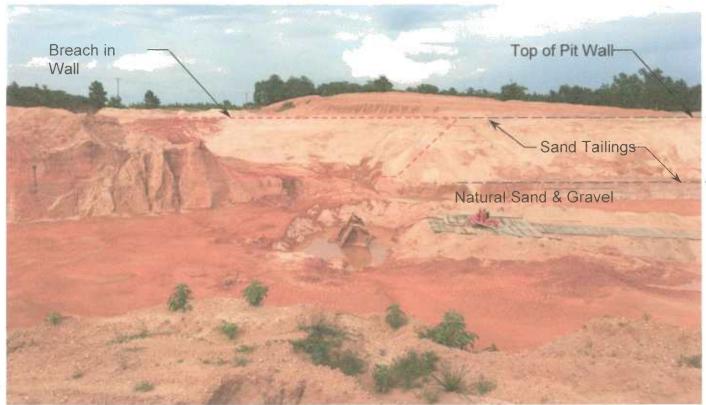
View of the failure area and breach looking easterly from the west side of the pit.
